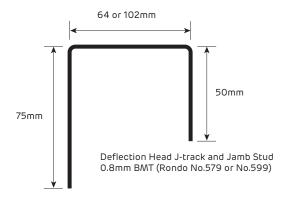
Shaft Wall Deflection Head J-Track Section
